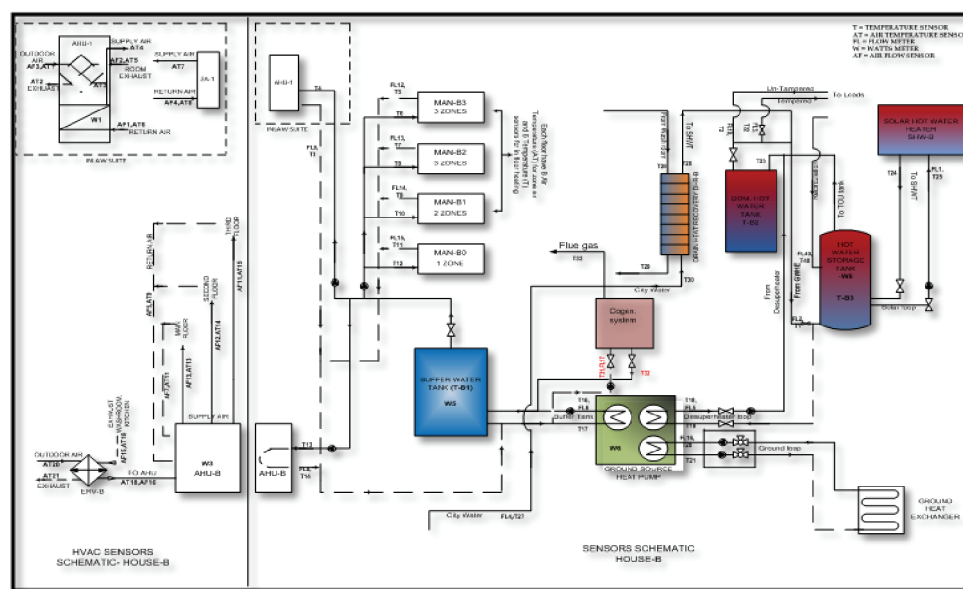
Layout of HVAC system and monitoring points in House-B and Inlaw suite
